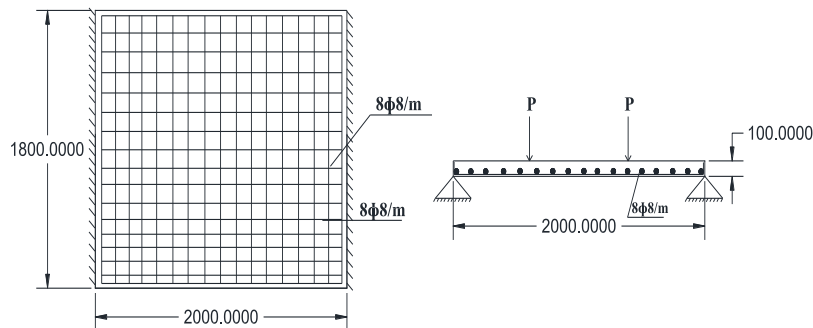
Reinforcement and Concrete Dimensions of Slab S3-1
